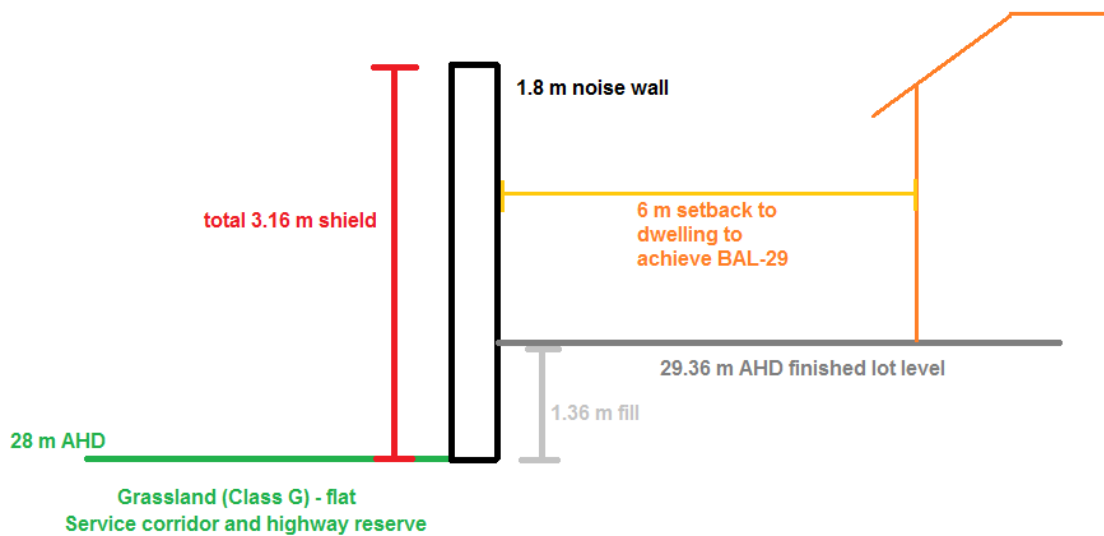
Indicative cross section showing Design Fire 1 (note: drawing not to scale)
